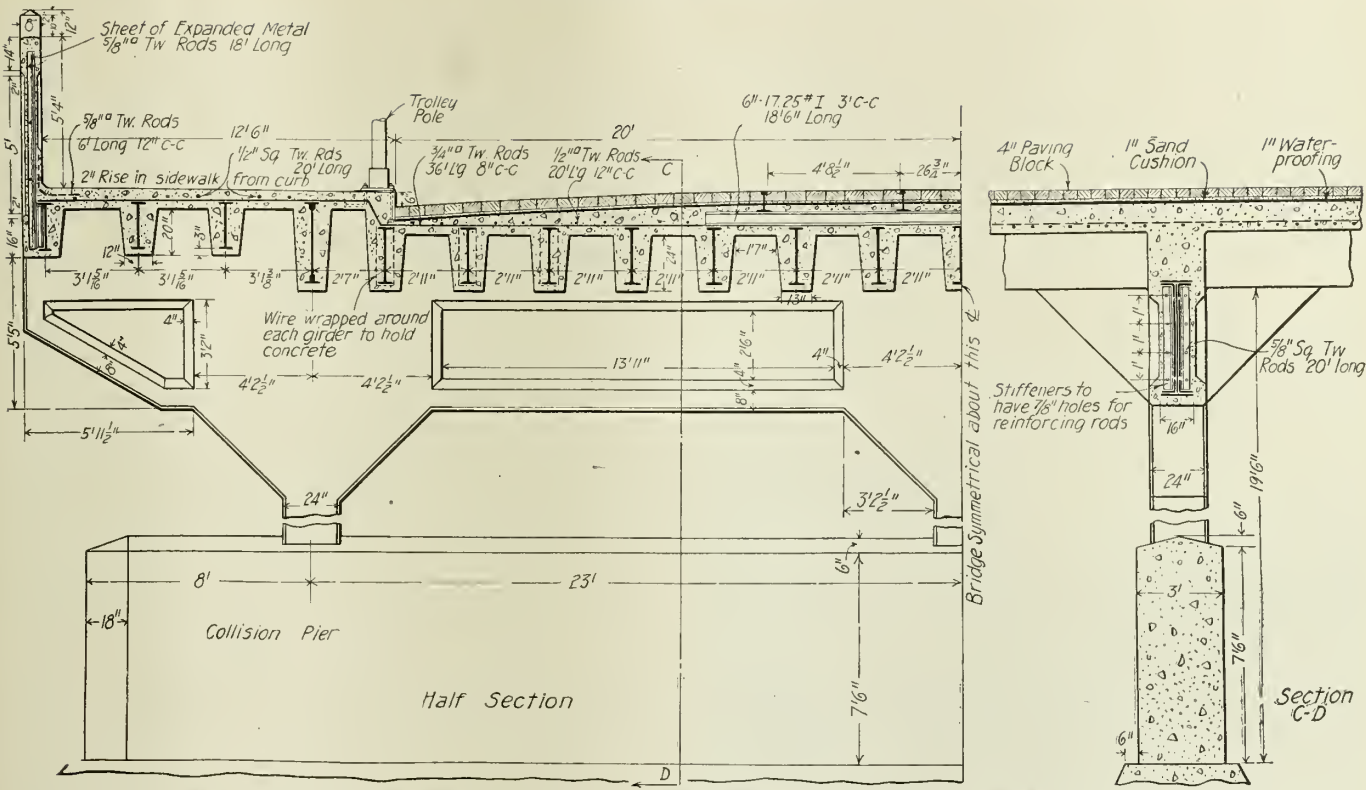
Transverse and Longitudinal Section of Front Street Viaduct, Coal Dock Improvement, Hocking Valley Ry., East Toledo.
